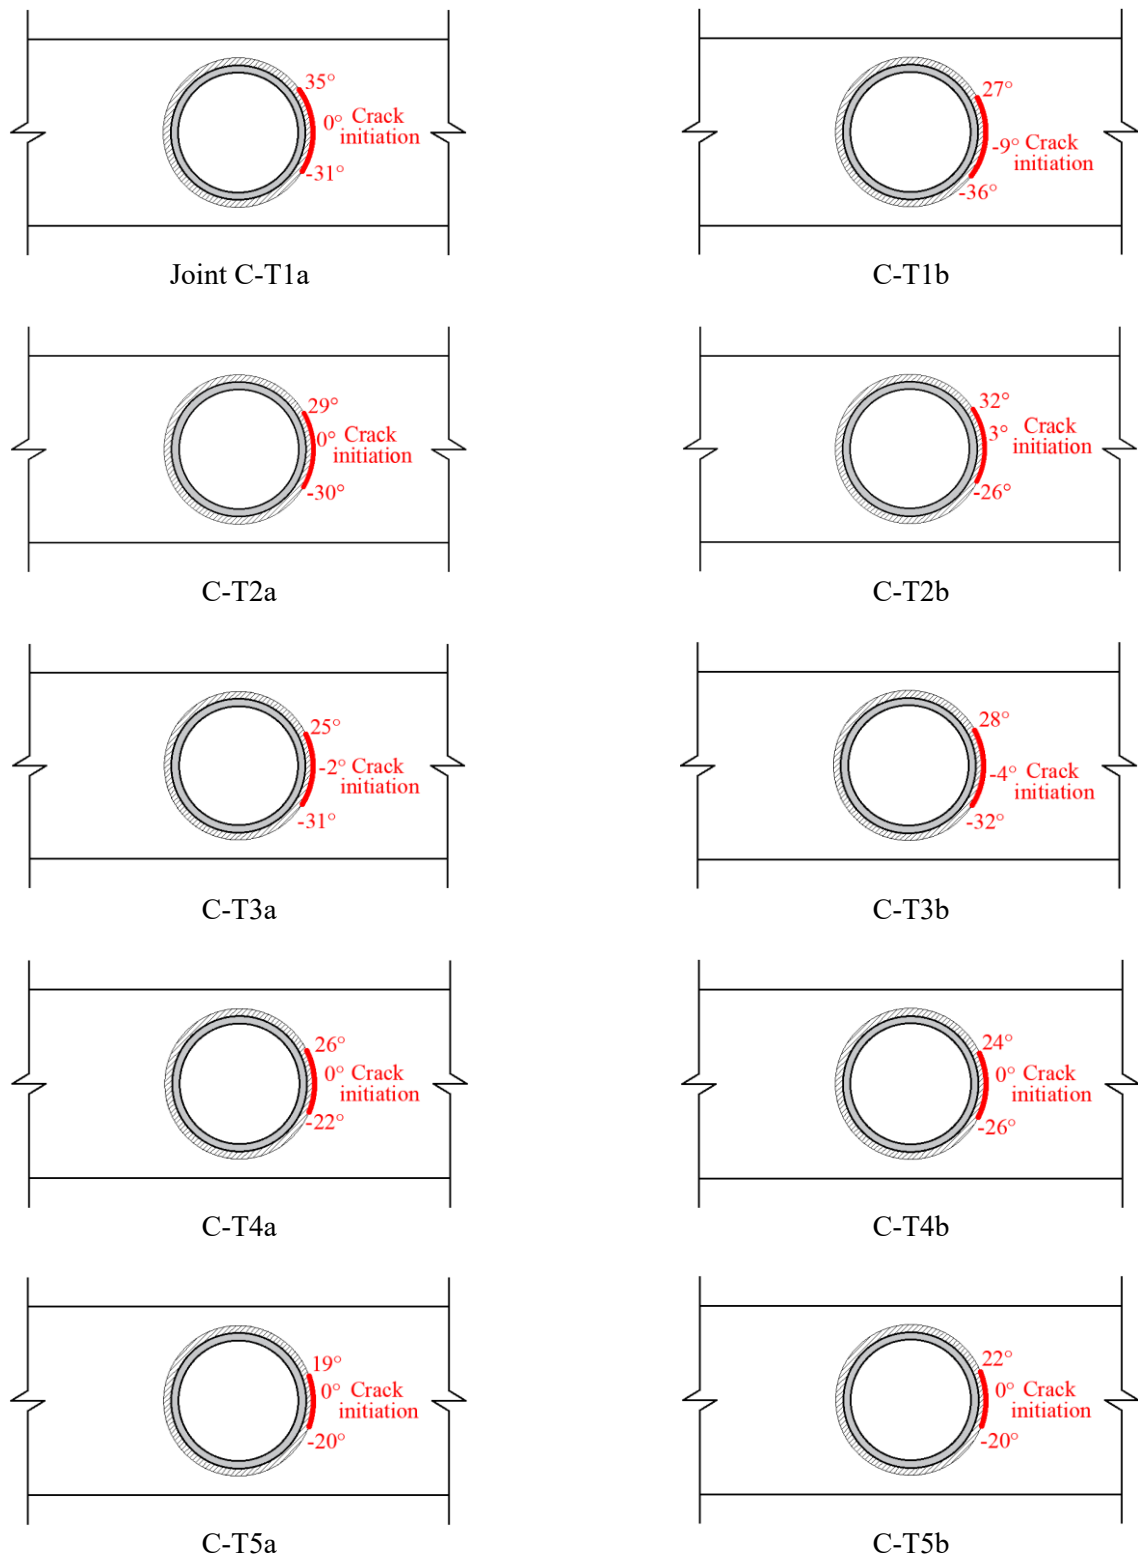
Surface crack characteristics along the weld collars of S690 welded T-joints at 5% strength reductions
